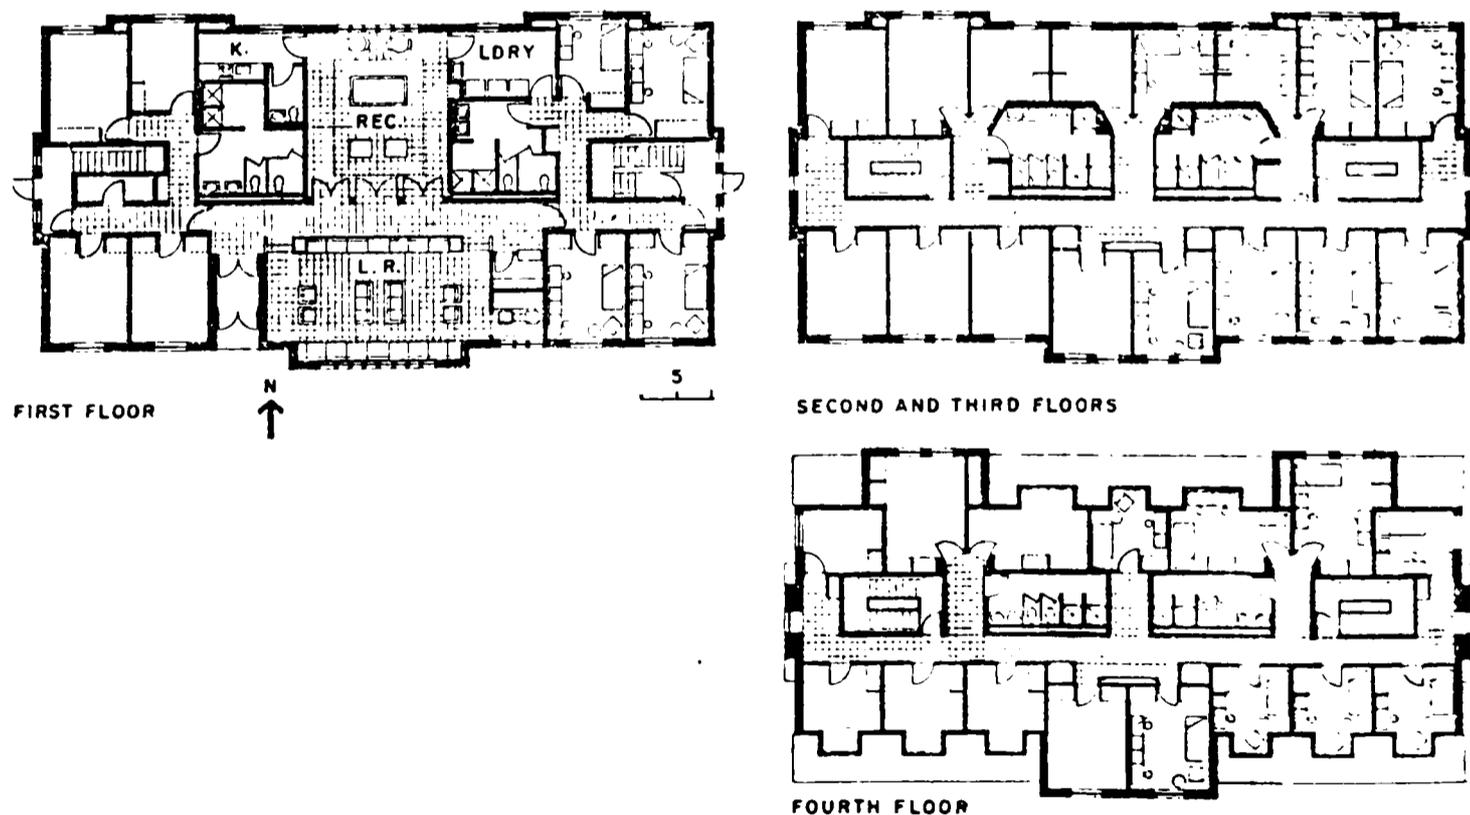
Mid-Quad Dormitories Floor Plans
